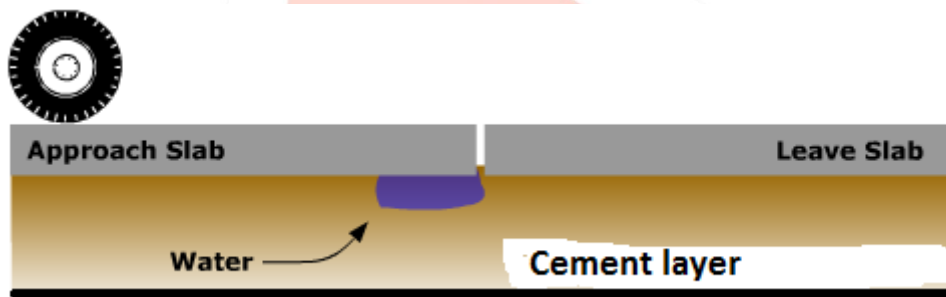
, Pumping and Faulting Load act at approach slab (Muench, 2003)
